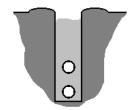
Horizontal installation for a single-pipe system showing two pipes
